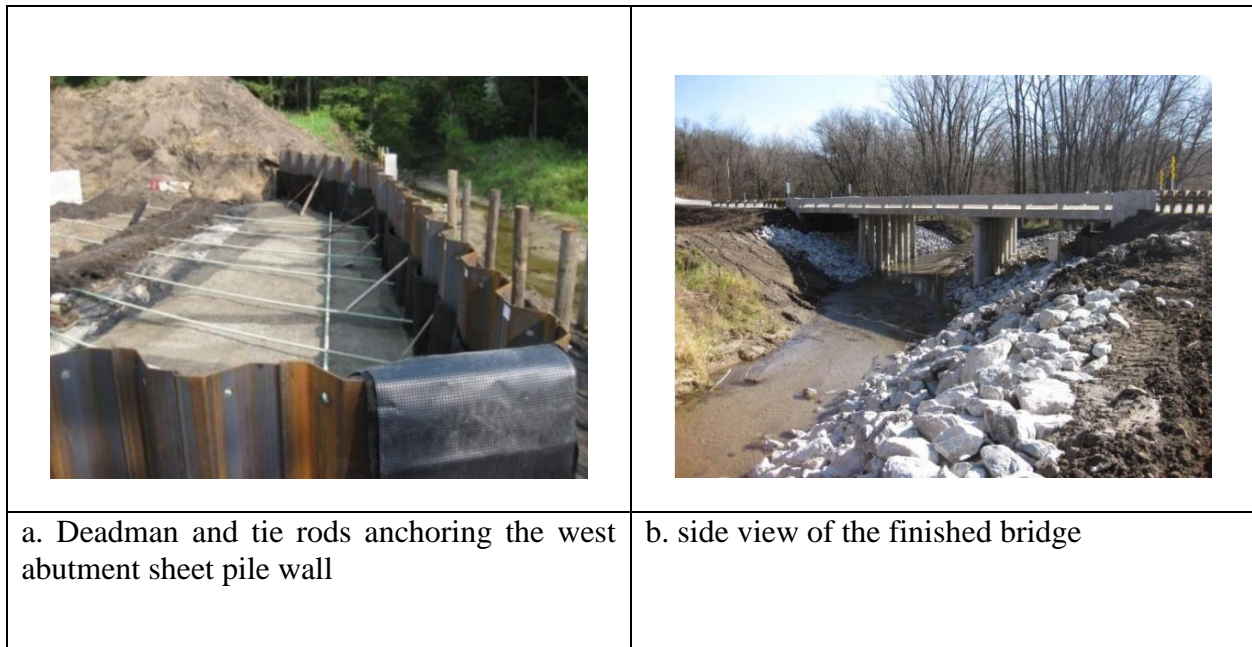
Boone County bridge resting on sheet pile walls (Evans et al., 2012)
